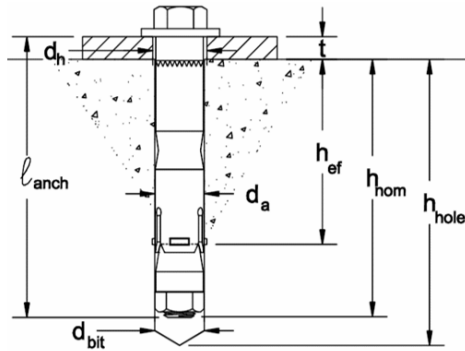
POWER-BOLT+ ANCHOR DETAIL
